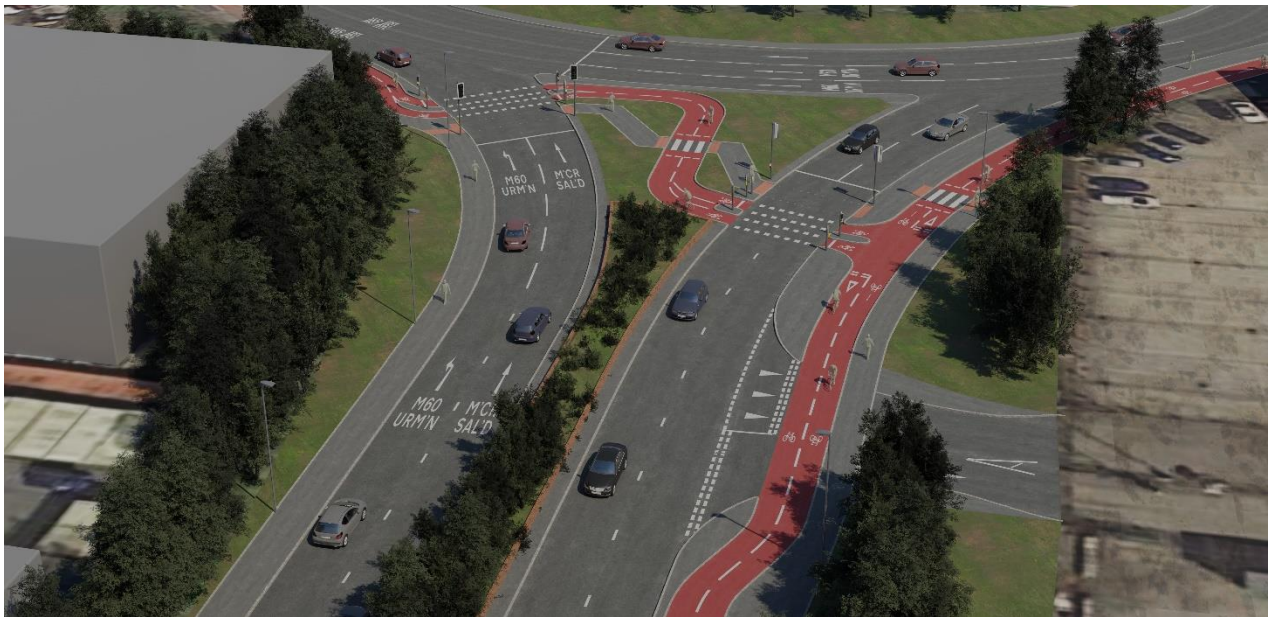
Proposed upgrade of the existing 'toucan' crossings at Village Circle to signal-controlled 'sparrow' crossings, connecting to existing cycle facilities along Village Way.
